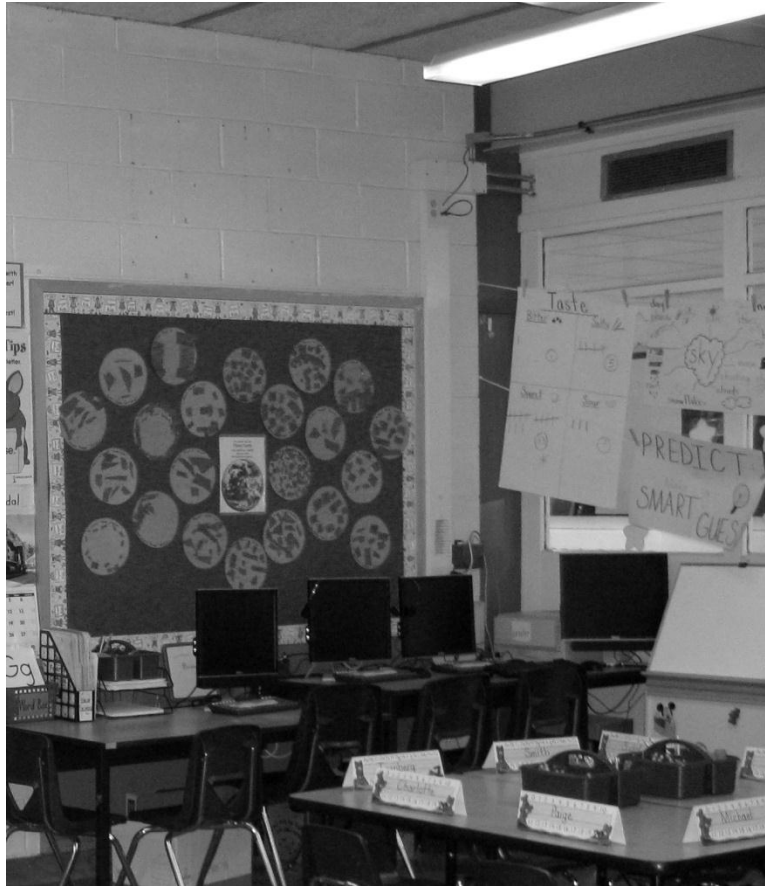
Typical student computer station setup; note electrical outlets near ceiling.
